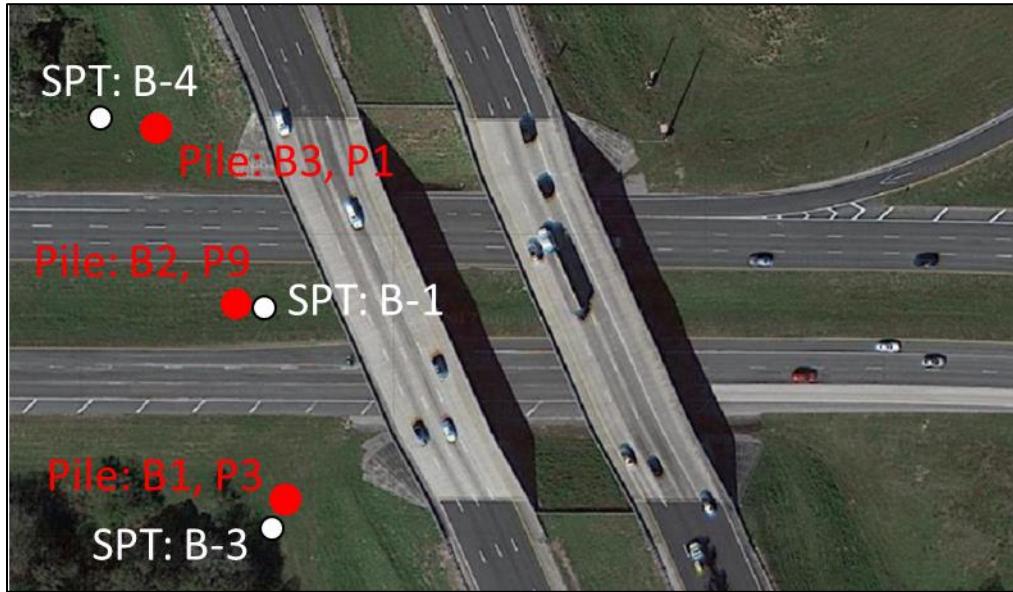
Test pile and SPT boring locations for I-75 over SR 64
